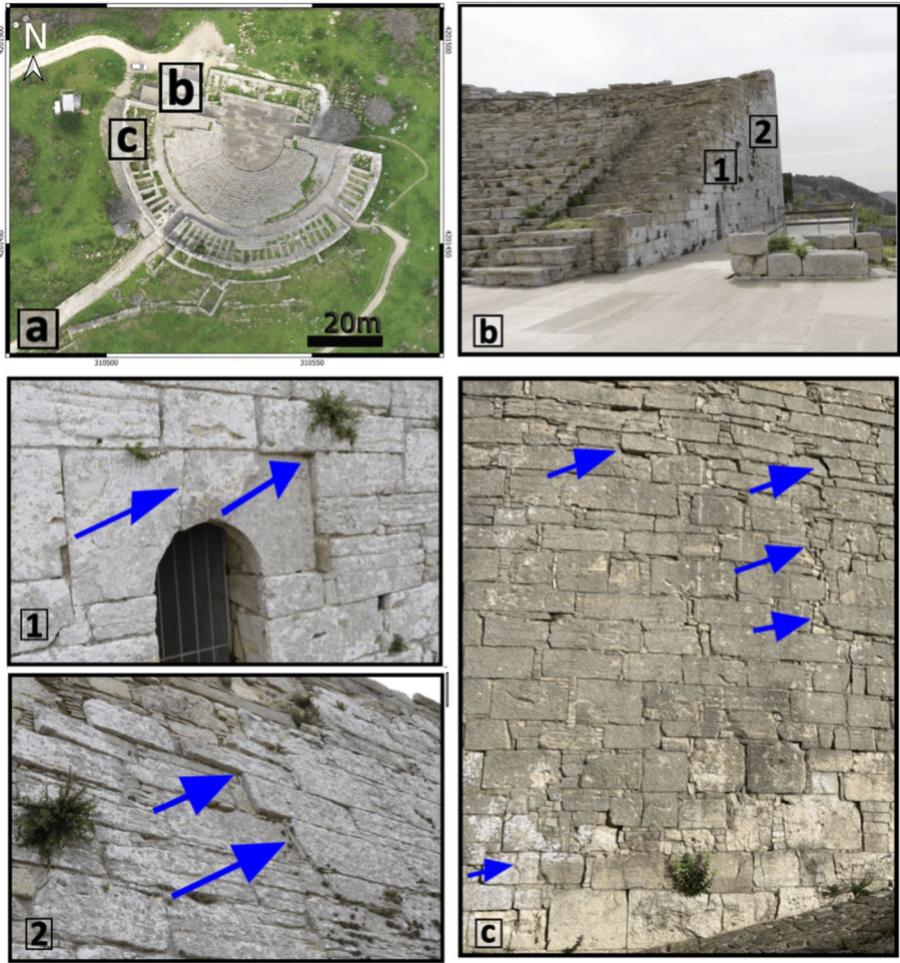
Deformation of the *analemma* wall of the Greek Theater, showing cracks, offsets, and structural misalignments; Top: a Orthophoto of the Greek Theater, with locations b and c indicating the positions of the detailed images below. Bottom: b Overview of the wall, with zones (1) and (2) marking key areas of deformation; (1) Close-up of the doorframe at the base of the wall, showing horizontal displacement and sagging of the arch (displacement direction: WNW-ESE); (2) Mid-section of the wall, displaying rotational misalignments and cracks, predominantly oriented along a WNW-ESE axis, suggesting progressive structural stress over time. c Rear view of the *analemma* wall, illustrating both vertical (N-S) and horizontal (E-W) cracks, as well as block offsets. These deformations are consistent with known seismic damage patterns in ancient masonry structures
